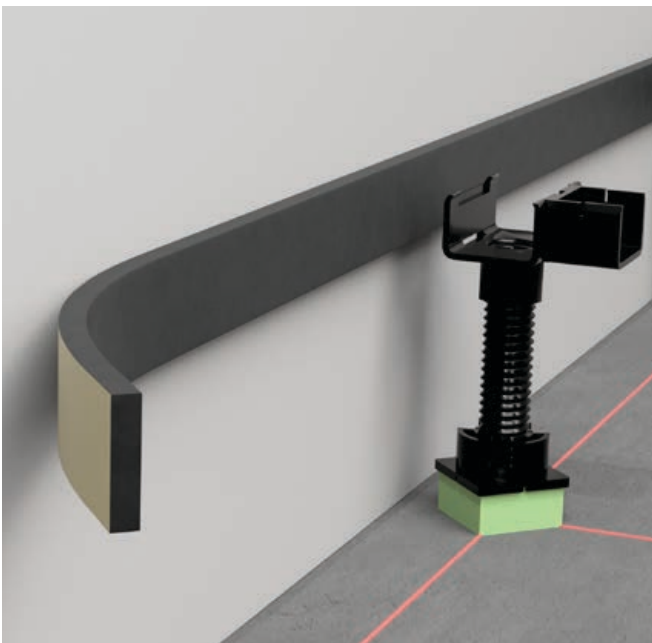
Mount self-adhesive elastic strip VT-Stripe on the walls at the height of future floor boards.
